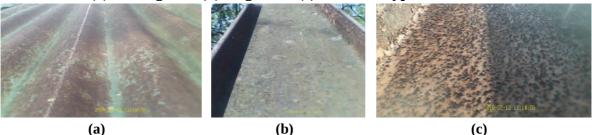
(a-c) Corresponding Visual Inspection Recorded Close Surface Defects
